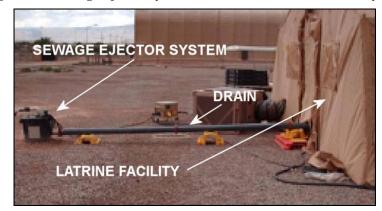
Sewage Ejector System Installed Next to Latrine Facility.
